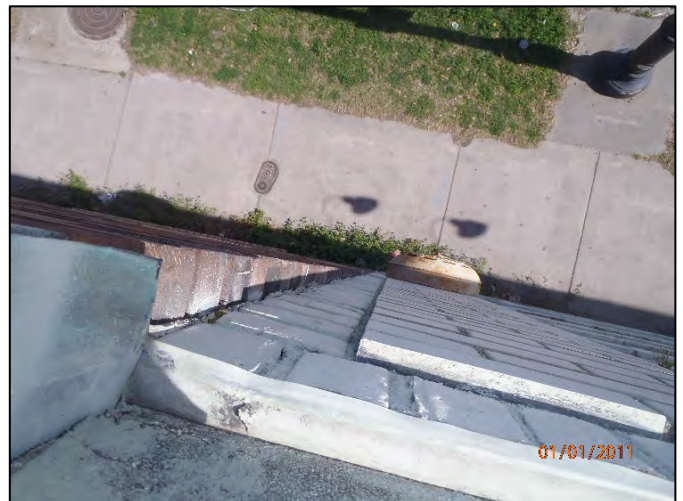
Cracks in stucco veneer at east wall
